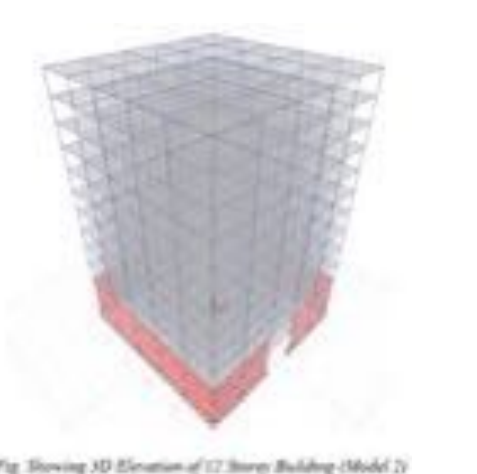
D Elevation of 12 Storey Building (Model 2)
